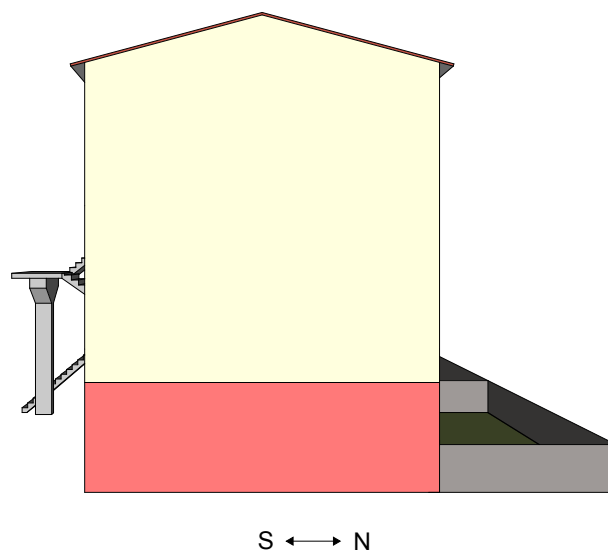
Front elevation of the three storey URM building used for the numerical model.
